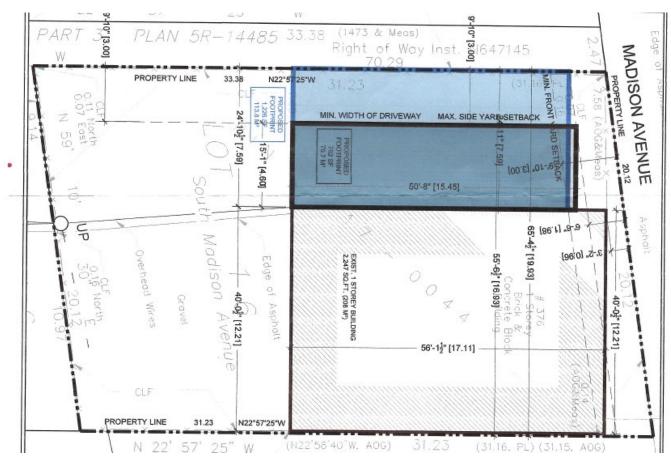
Site Plan of the subject property showing the existing development and proposed building addition on the site.
